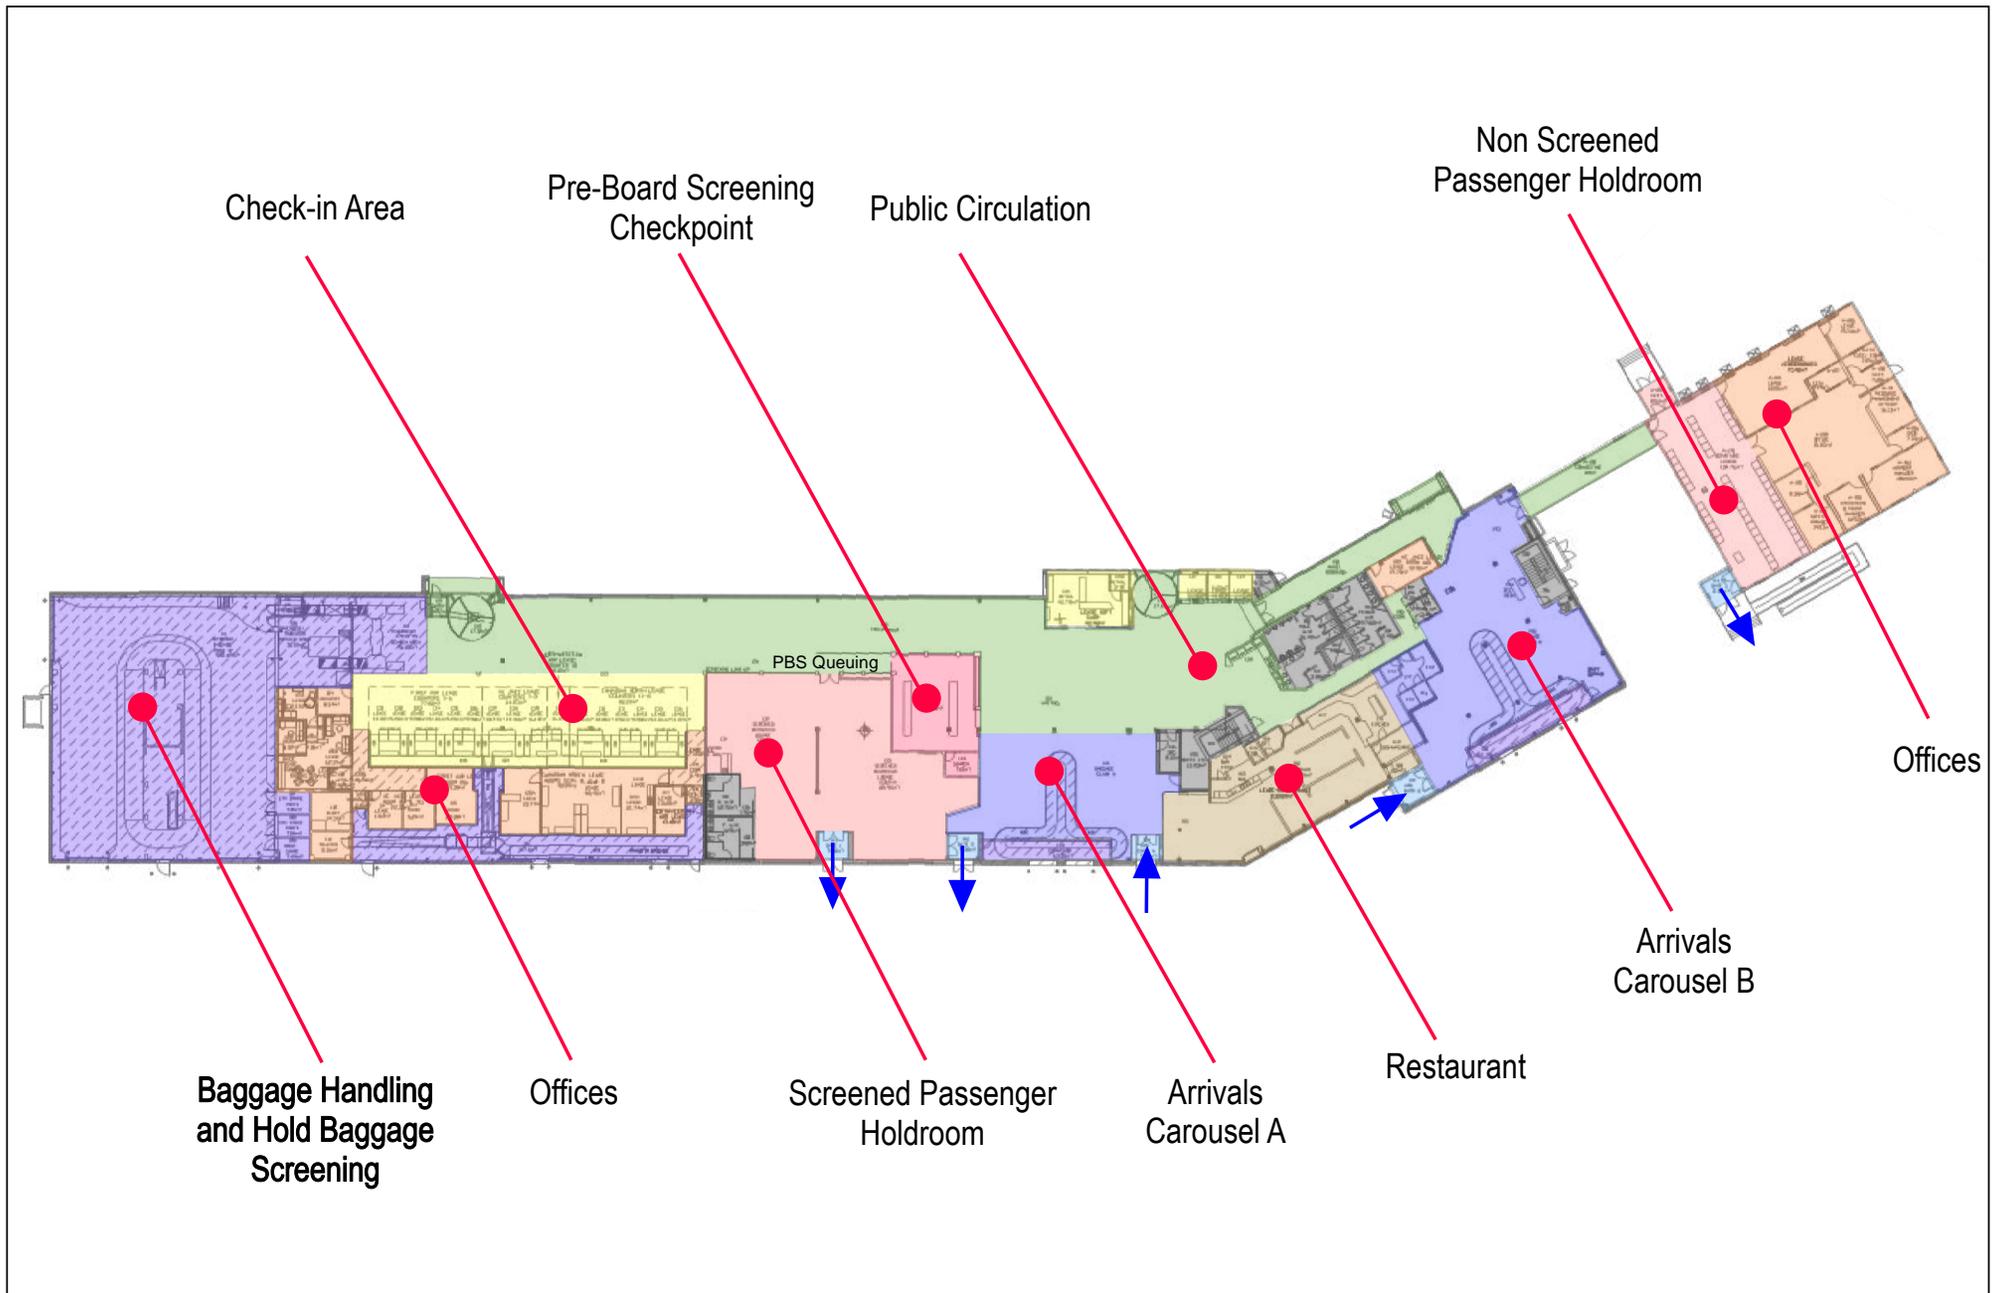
Yellowknife Airport ATB - Existing Layout (Ground Floor)
